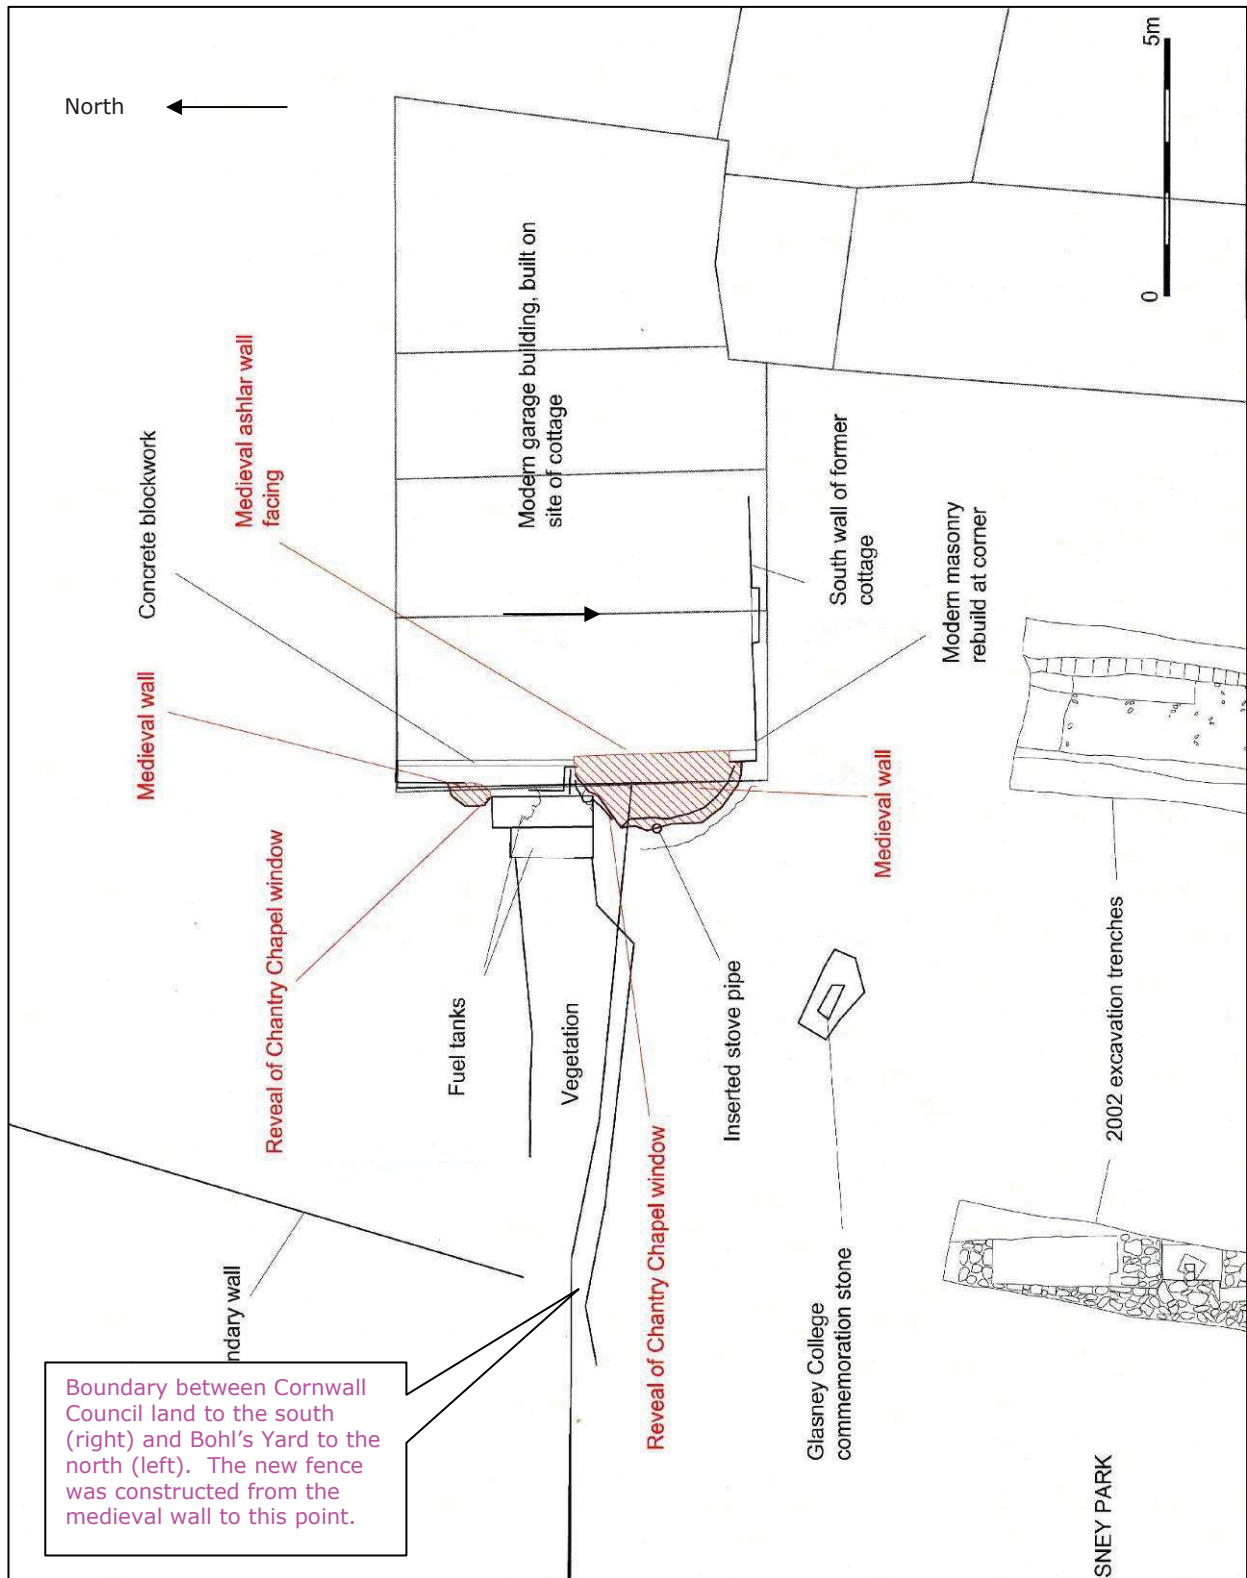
Plan of all that remains visible of Glasney College in the NE corner of Glasney Field and adjoining Bohl's Yard: the original walling is shown in red. The plan is overlain on the plan of excavation trenches dug in 2003 (Cole 2005, fig 7)
